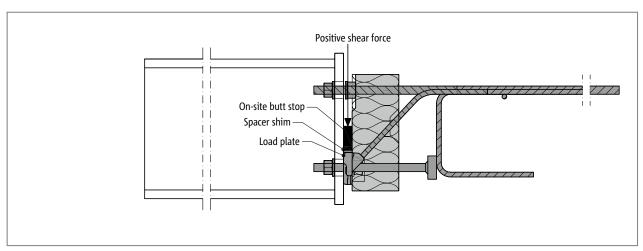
Schöck Isokorb® T type SK: On-site butt stop for transferring shear forces
